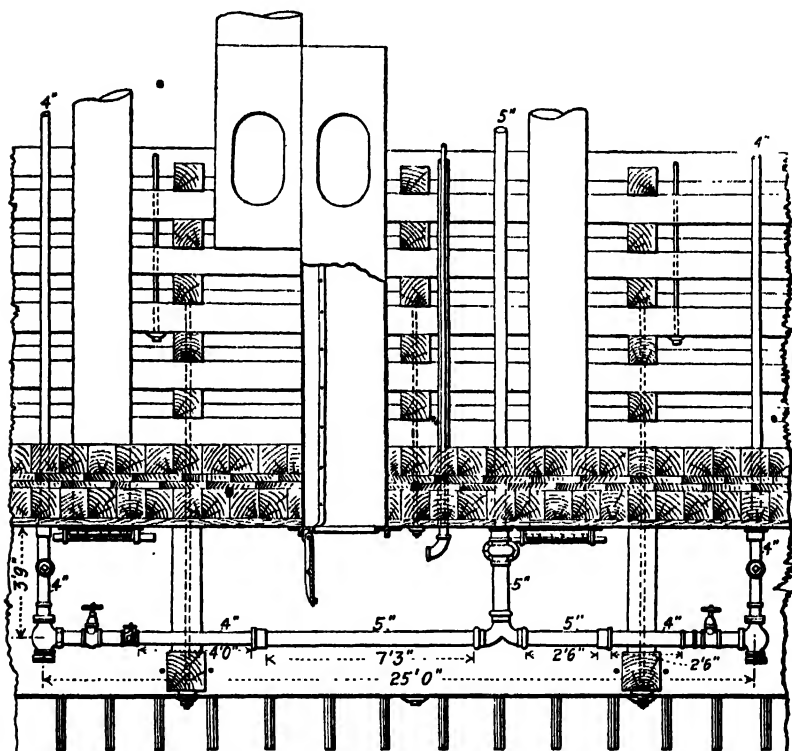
Arrangement of Air-Lock, Shafts, Pipes, Etc., Bellefontaine Bridge.
